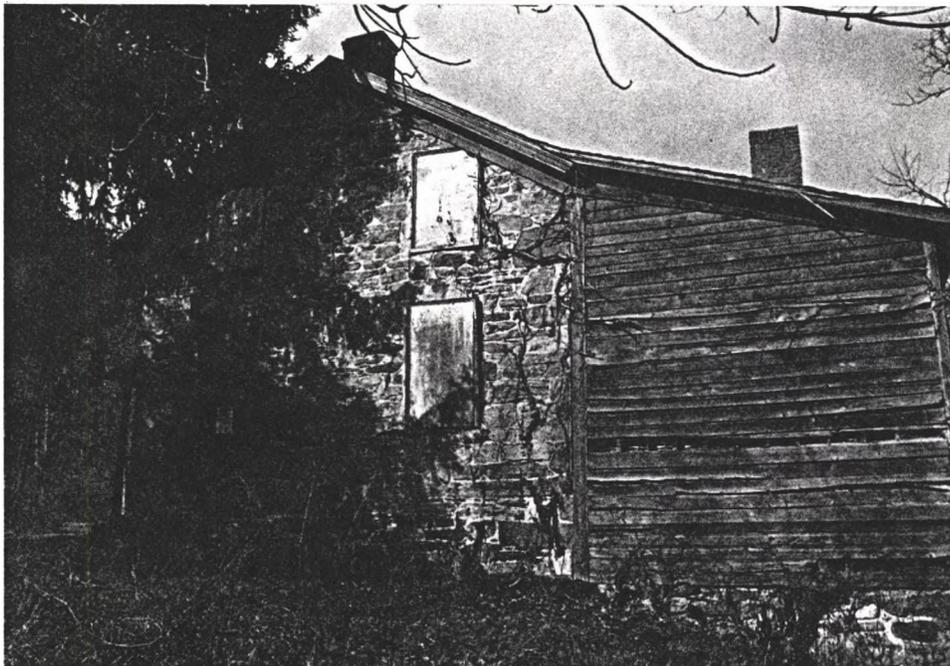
West side of frame addition. Note ghost of original stair below platform.
